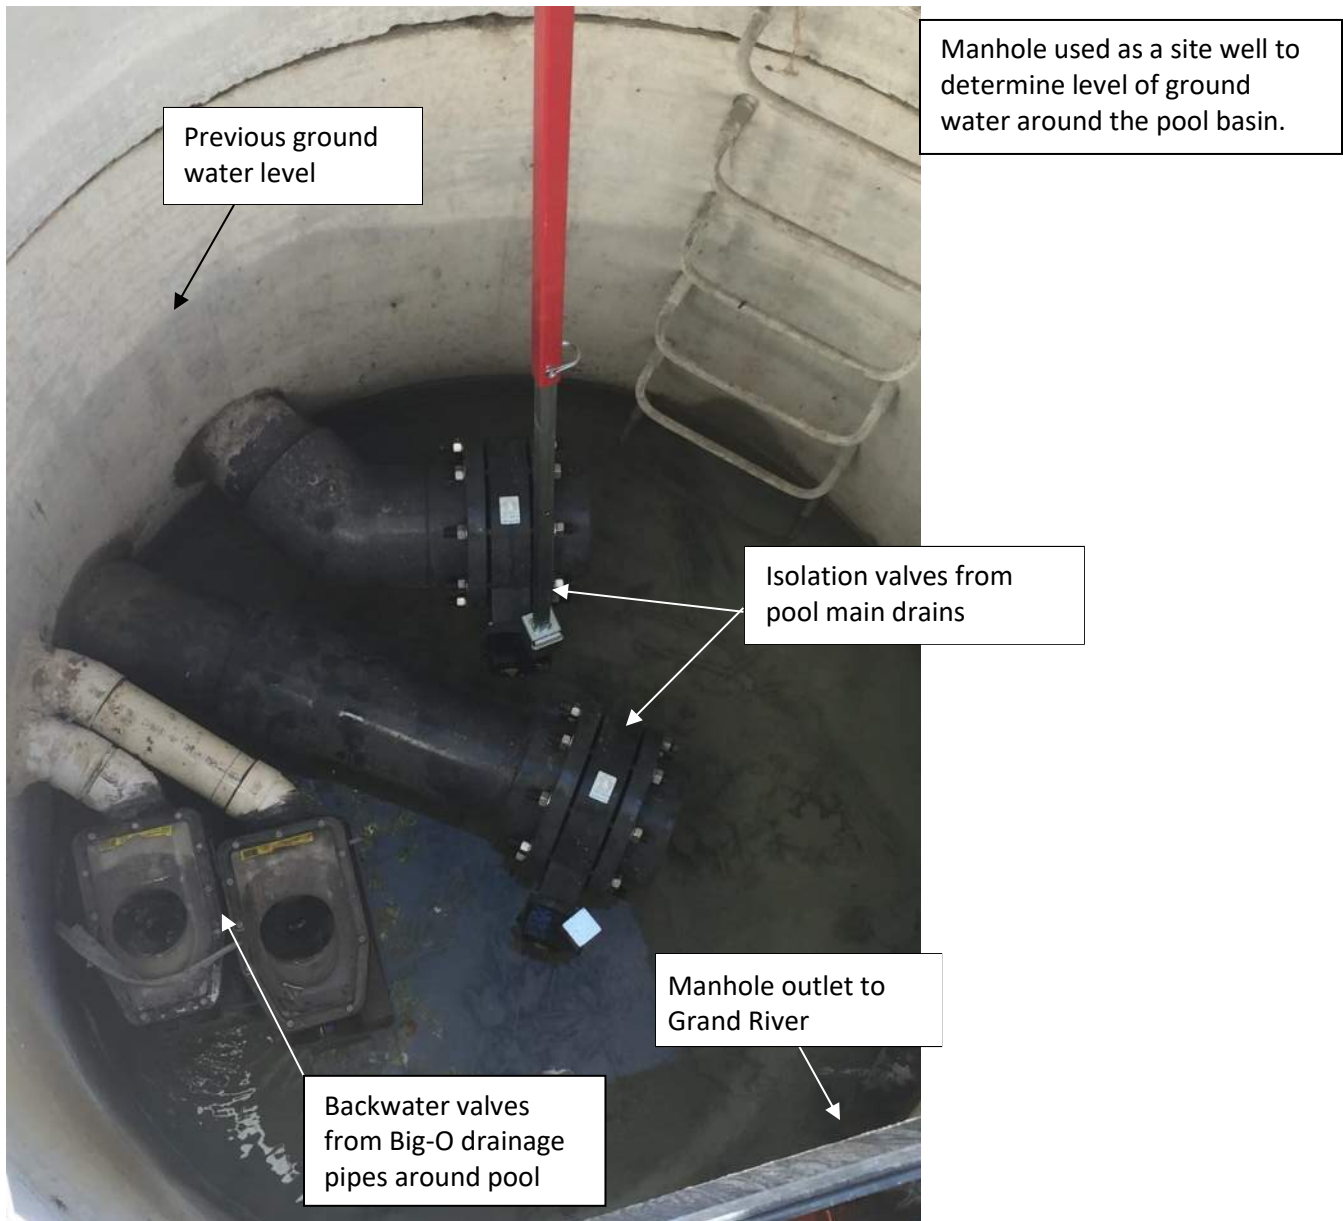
Kiwanis Park, Kitchener manhole drainage system.
